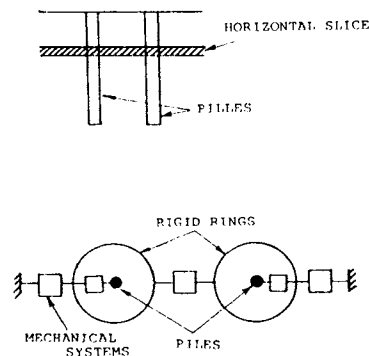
Horizontal Slice in Soil-Pile System and Plan View of Soil Model
